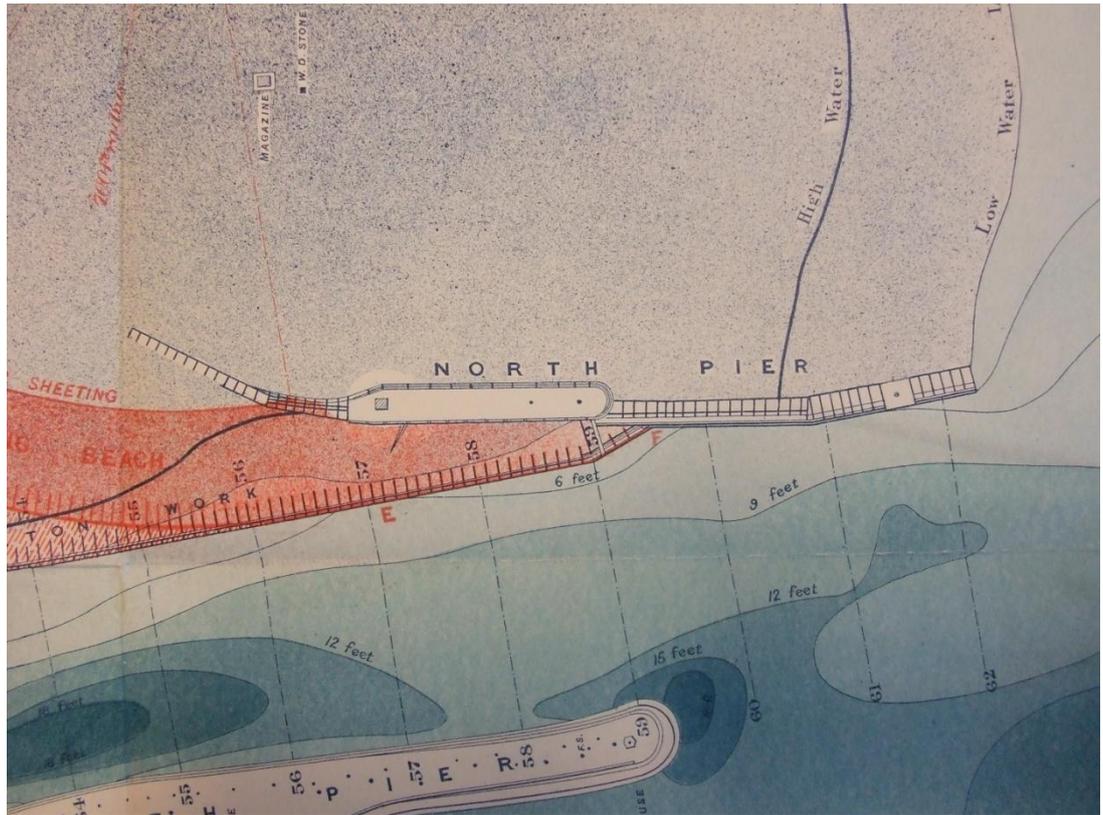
, Coode, 1885 Plan showing lateral divisions within north pier (NRO Y/PH 120c)
